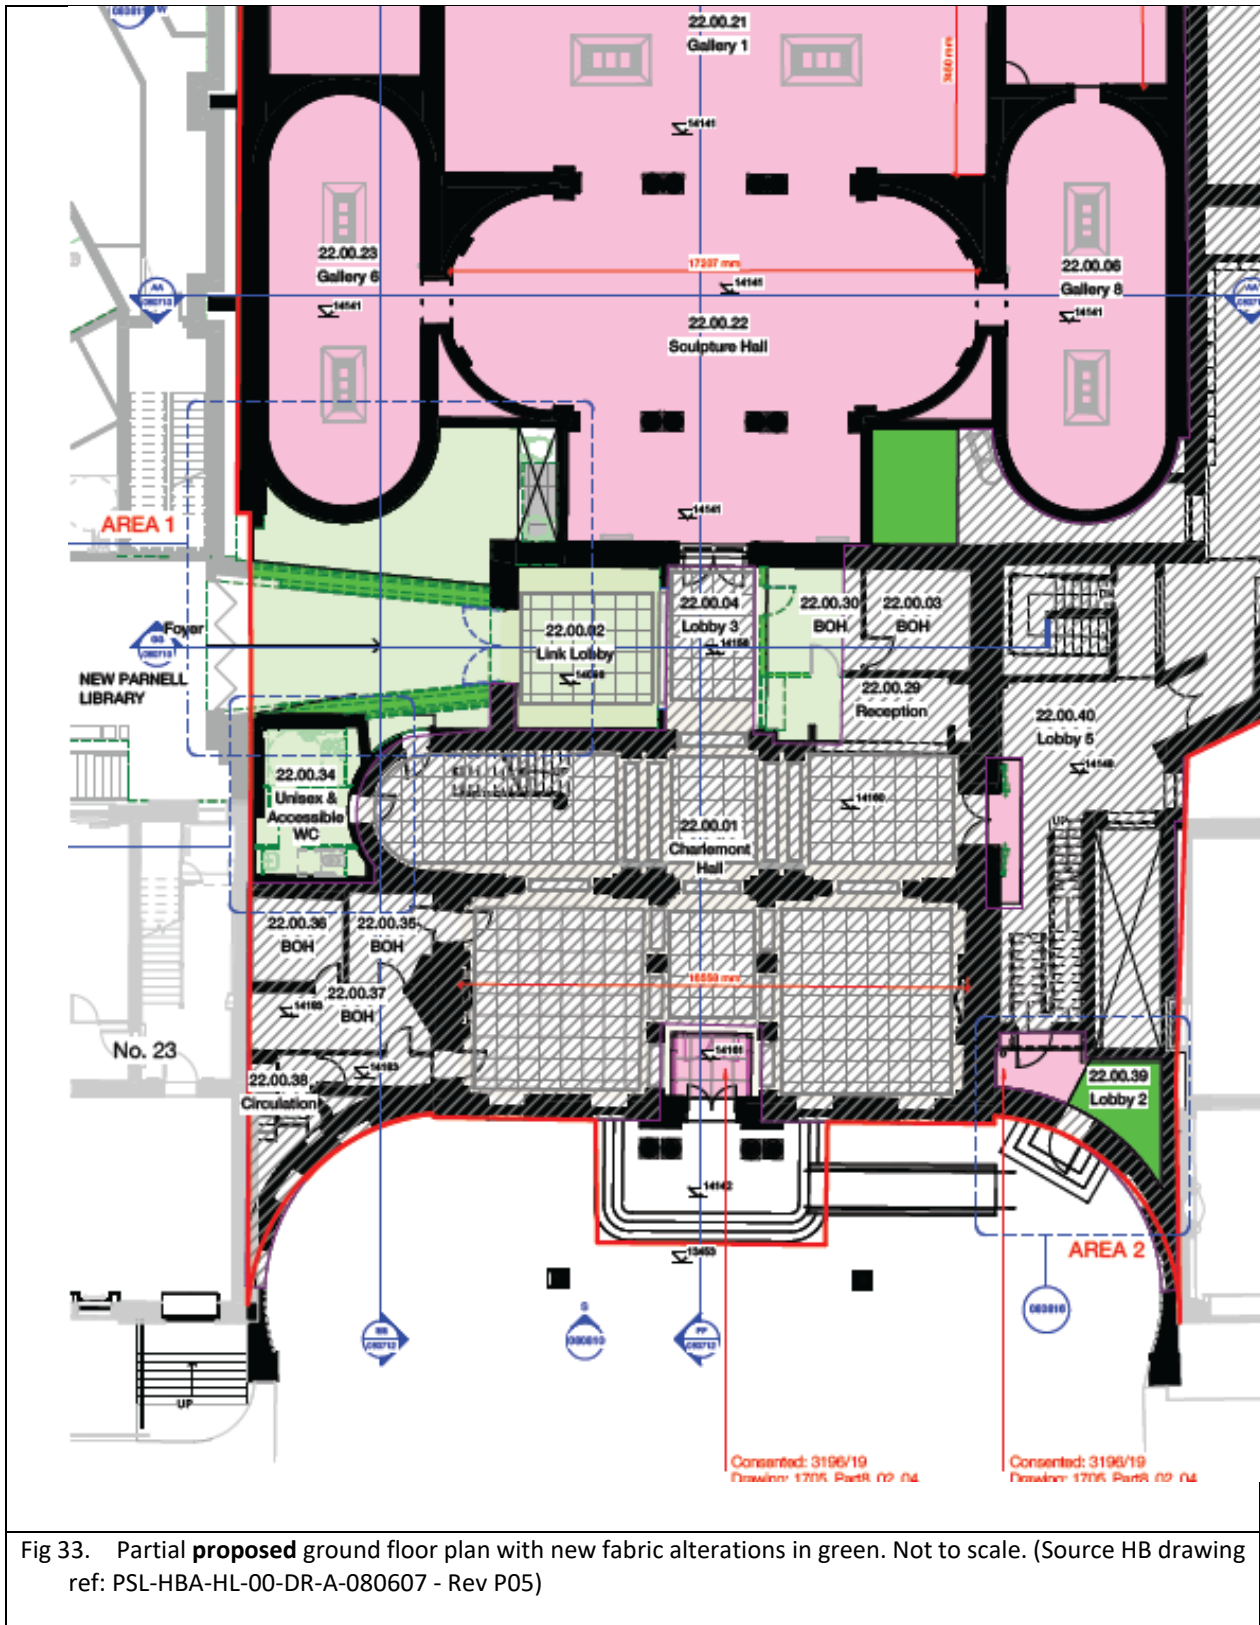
Partial proposed ground floor plan with new fabric alterations in green. Not to scale. (Source HB drawing ref: PSL-HBA-HL-00-DR-A-080607 - Rev P05)
